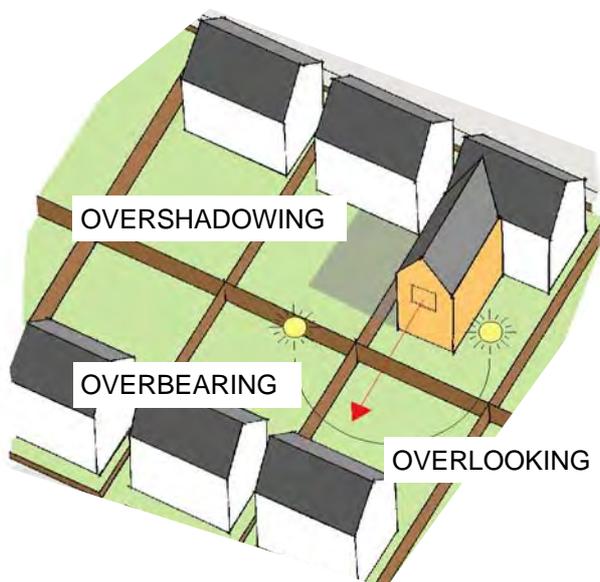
This extension would overlook and overshadow adjacent properties and would be overbearing to the adjoining rear gardens—this is not acceptable
